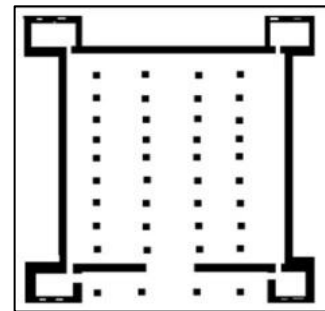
Columned hall of Larisa (Boehlau & Schefold, 1940)
